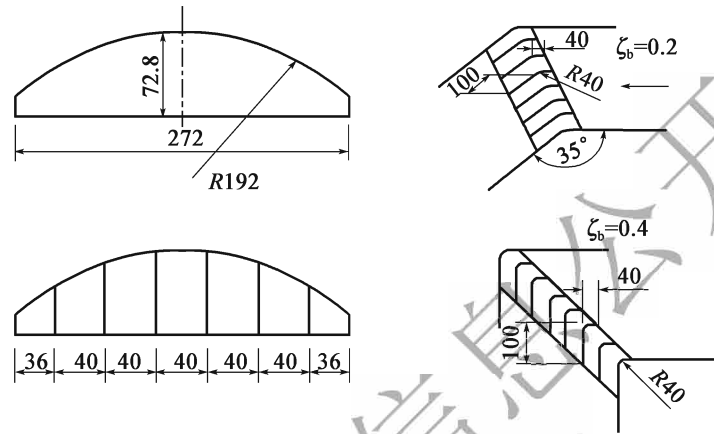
Loss coefficient of ceiling duct bending (unit: cm)
